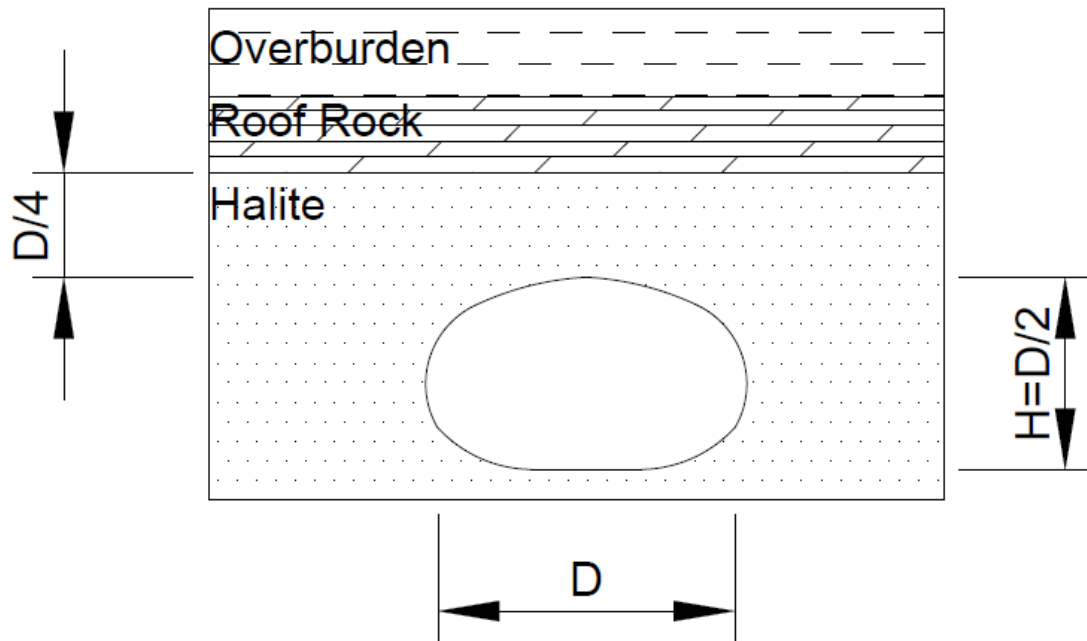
Recommended First Order Cavern Roof dimensions (Bruno and Dusseault, 2002; Zheng et al., 2016)
